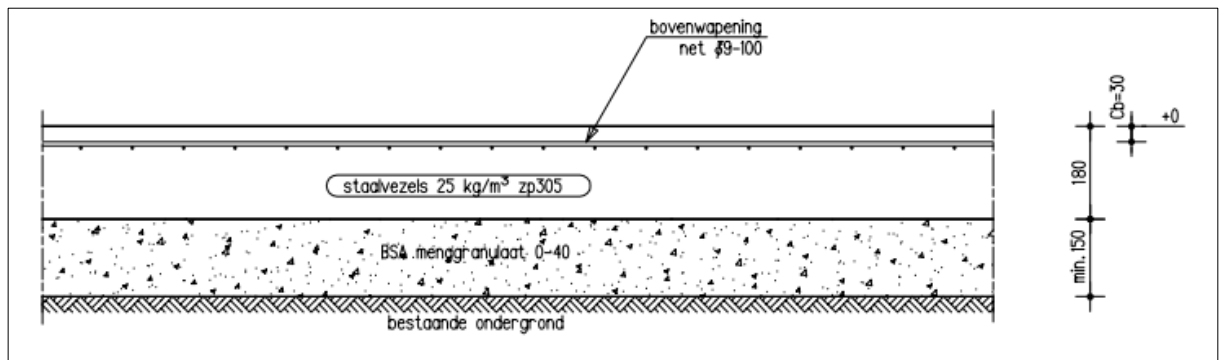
Detail drawing of a typical hybrid reinforced concrete floor.
